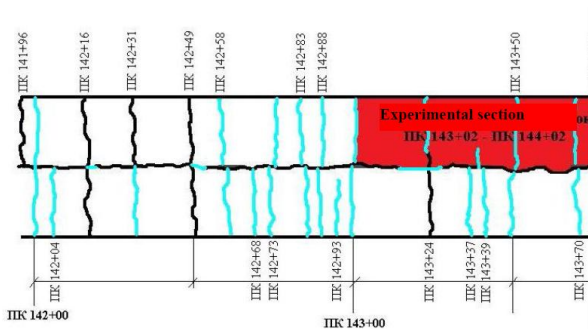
Transverse and longitudinal cracks propagation pattern at Chita-Khabarovsk autoroad section at km 365 (PK 142+00 – PK 144+02), revealed in 2011
